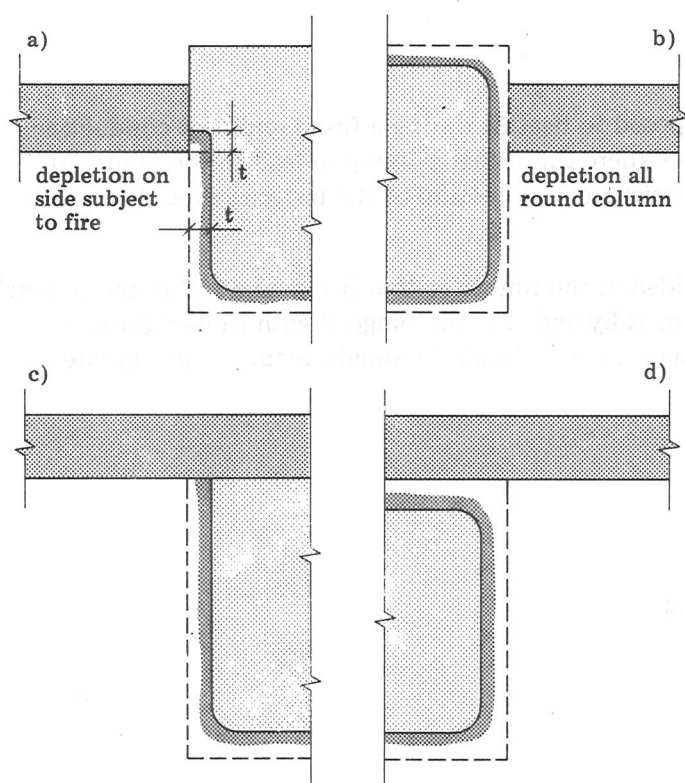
a) and c) Wall having fire resistance not less than the column.
